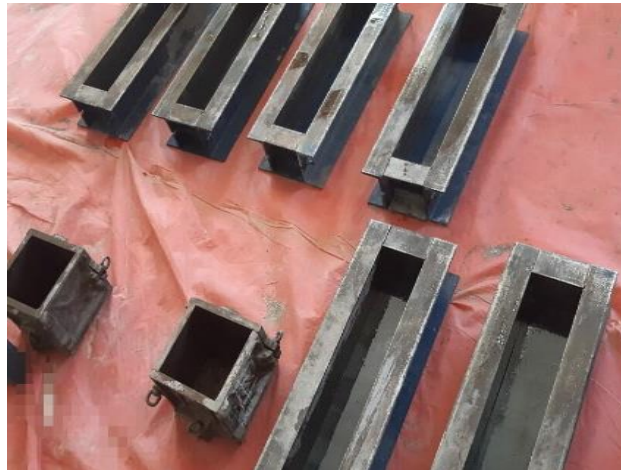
Beams (100×100×500 mm) and Cubes (150×150×150 mm) Specimens
